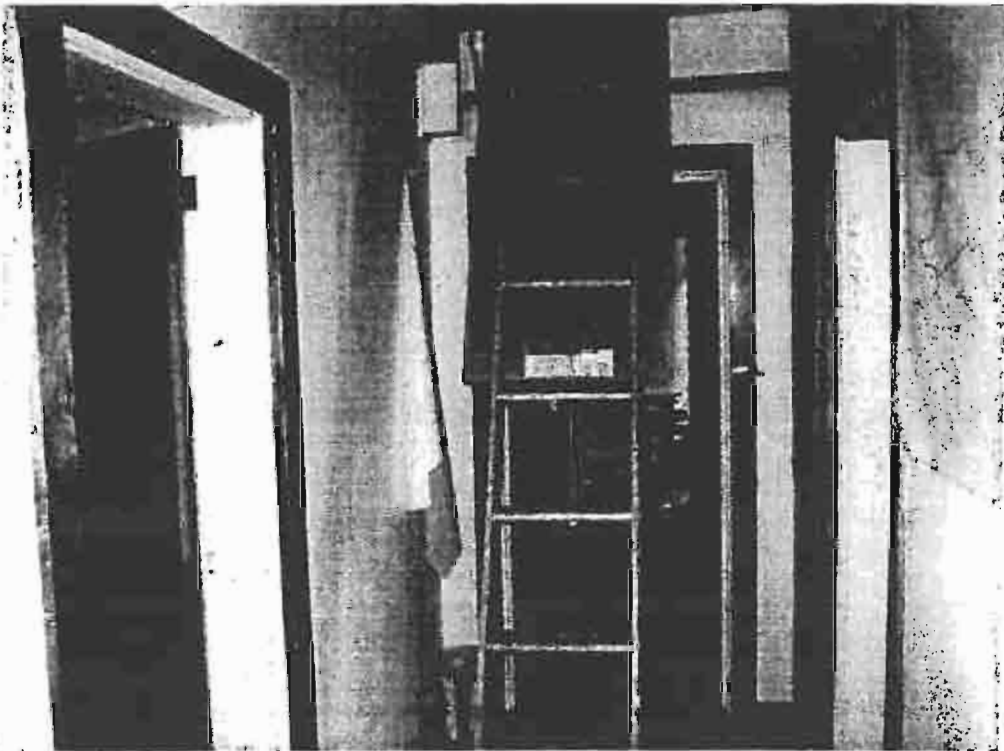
Water Damage to Corridor Drywall at Level 2. (2014-05-23)
